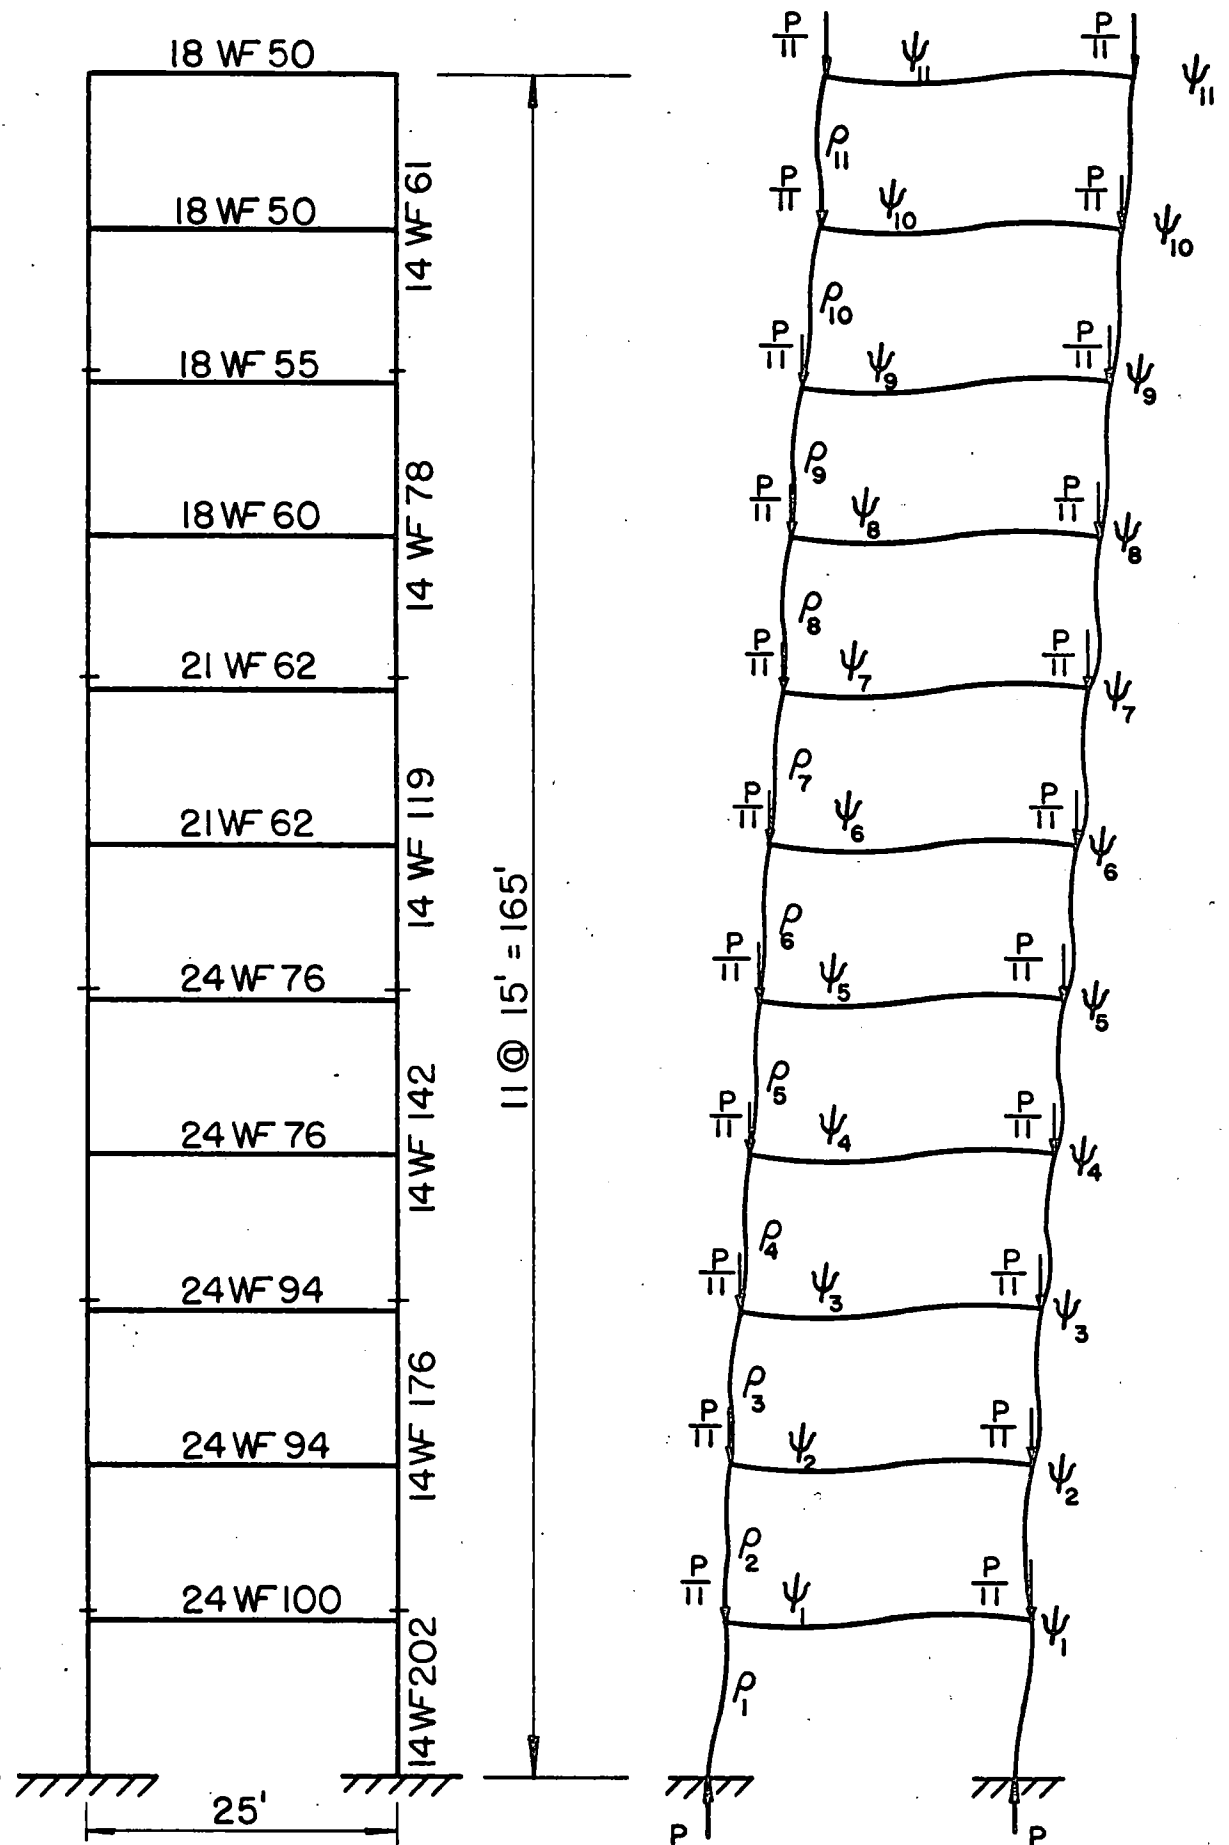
AN ELEVEN-STORY BUILDING FRAME
